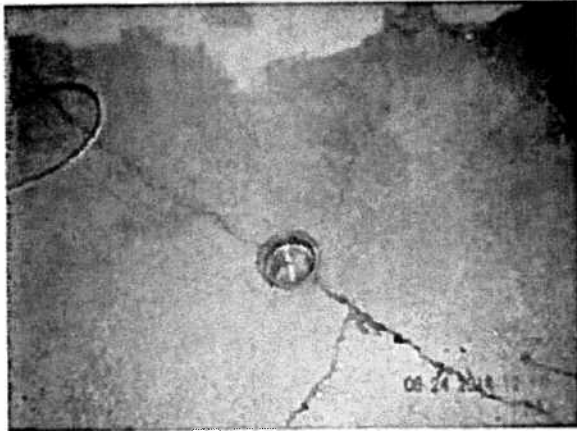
Floor drain in the wash/prep spray booth area that drains to sanitary and is mixed then flows to POTW.
